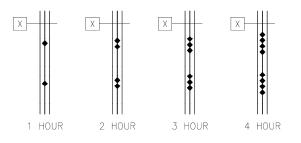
Representation of fire-rated partitions on the floor plan.
